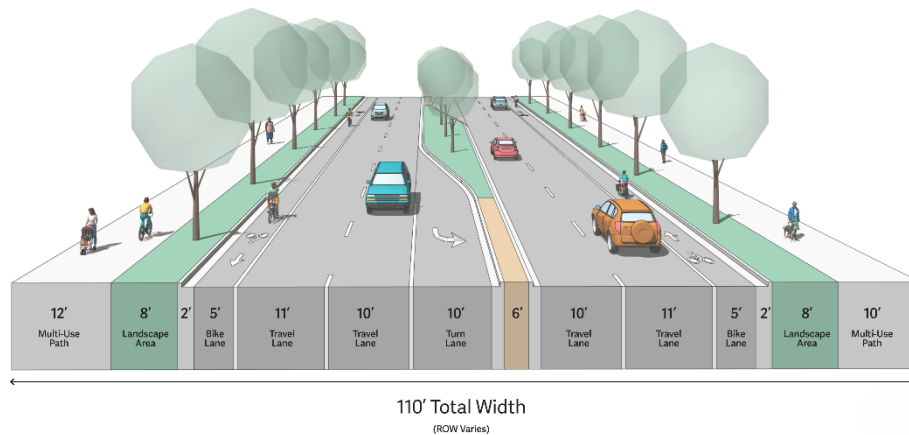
North 30th Valmont Road to Mapleton Avenue (Central Segment)
